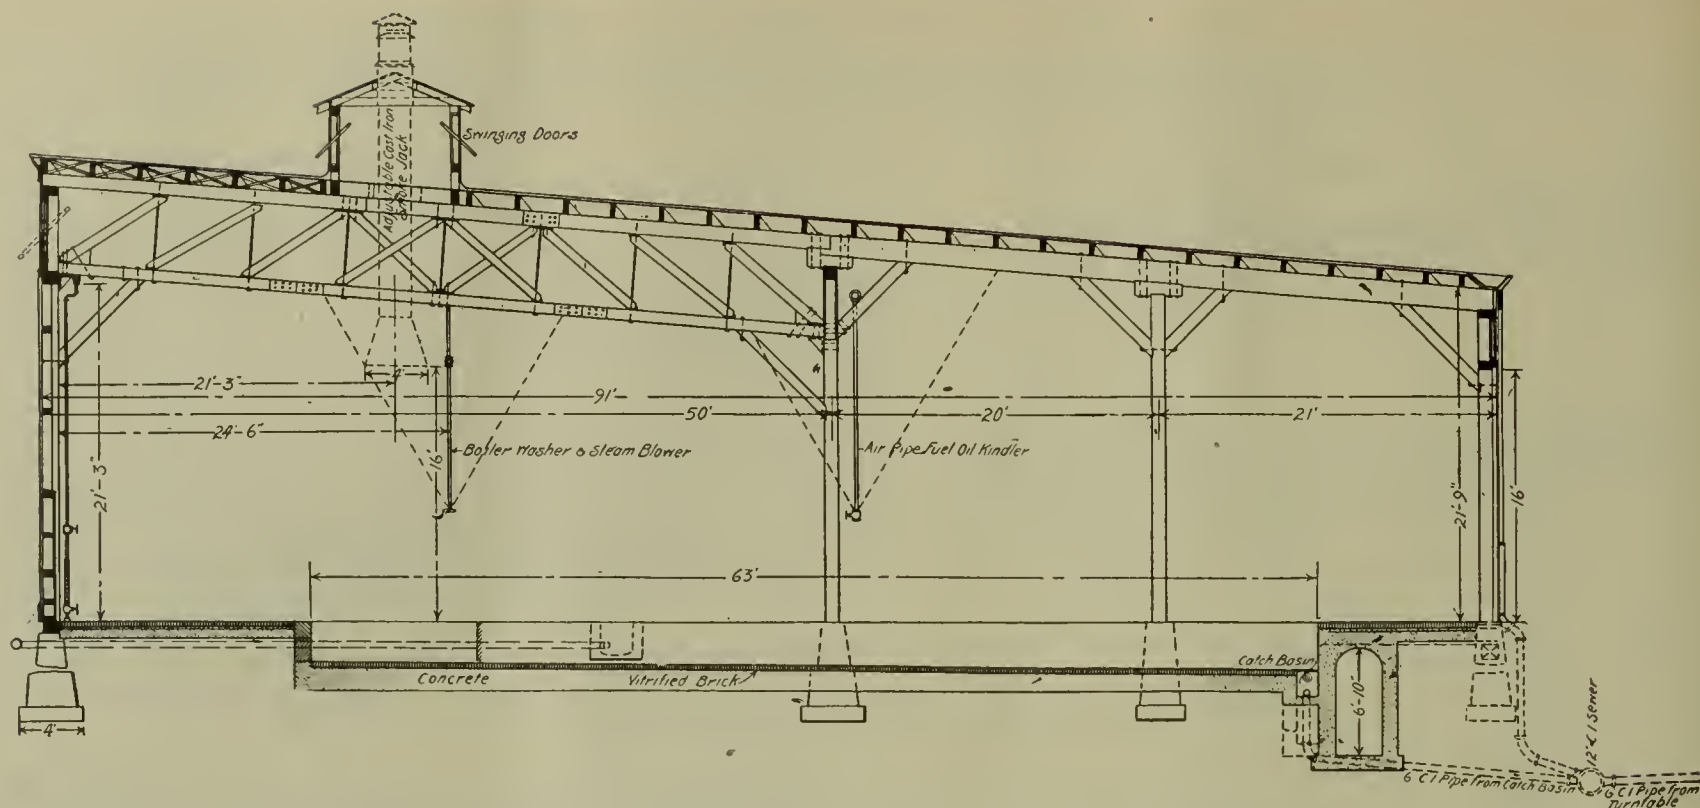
CROSS SECTION OF ROUNDHOUSE.
